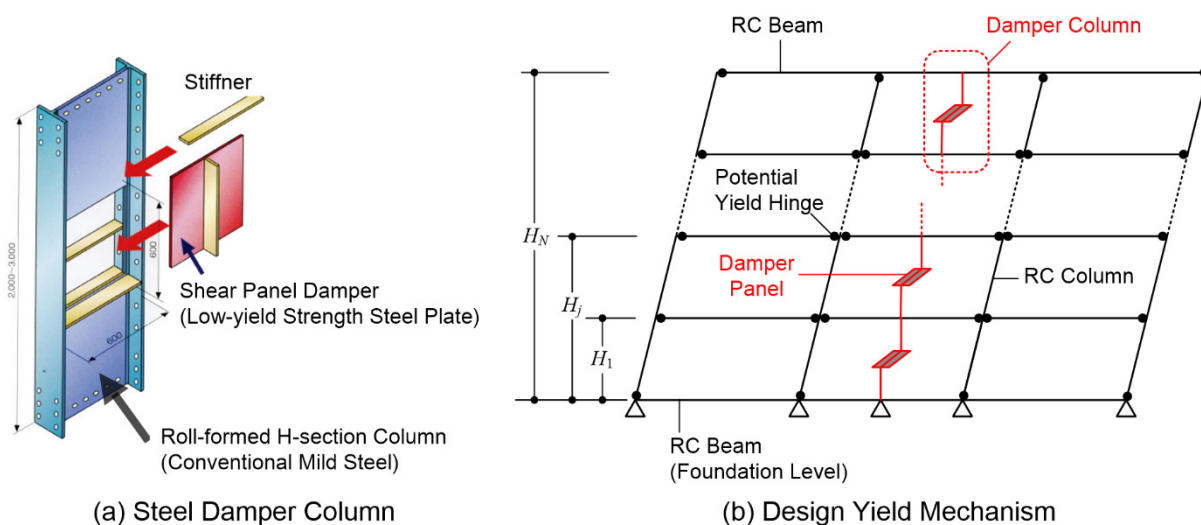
Steel damper column and design yield mechanism of RC frames.
